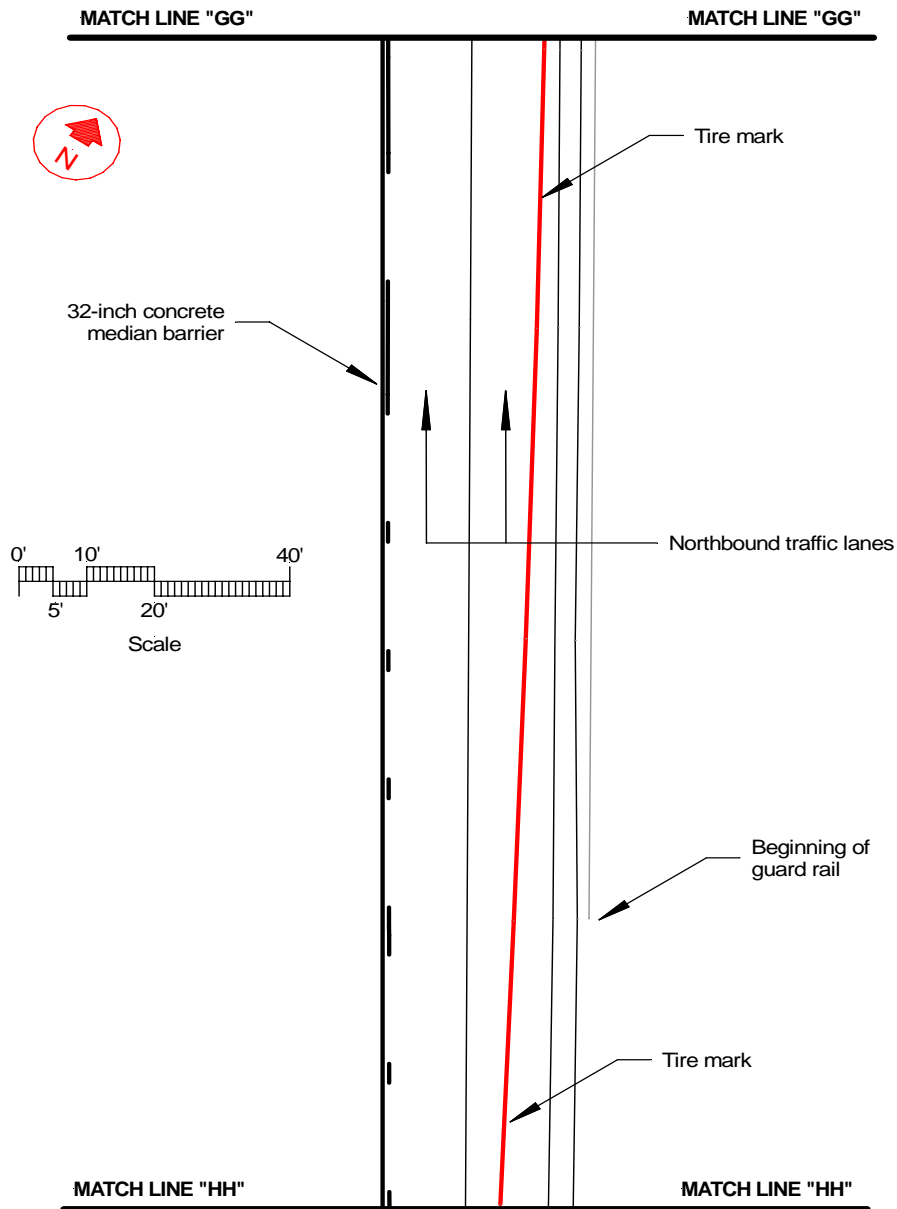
NTSB map of GG-HH pavement markings and roadway evidence.
